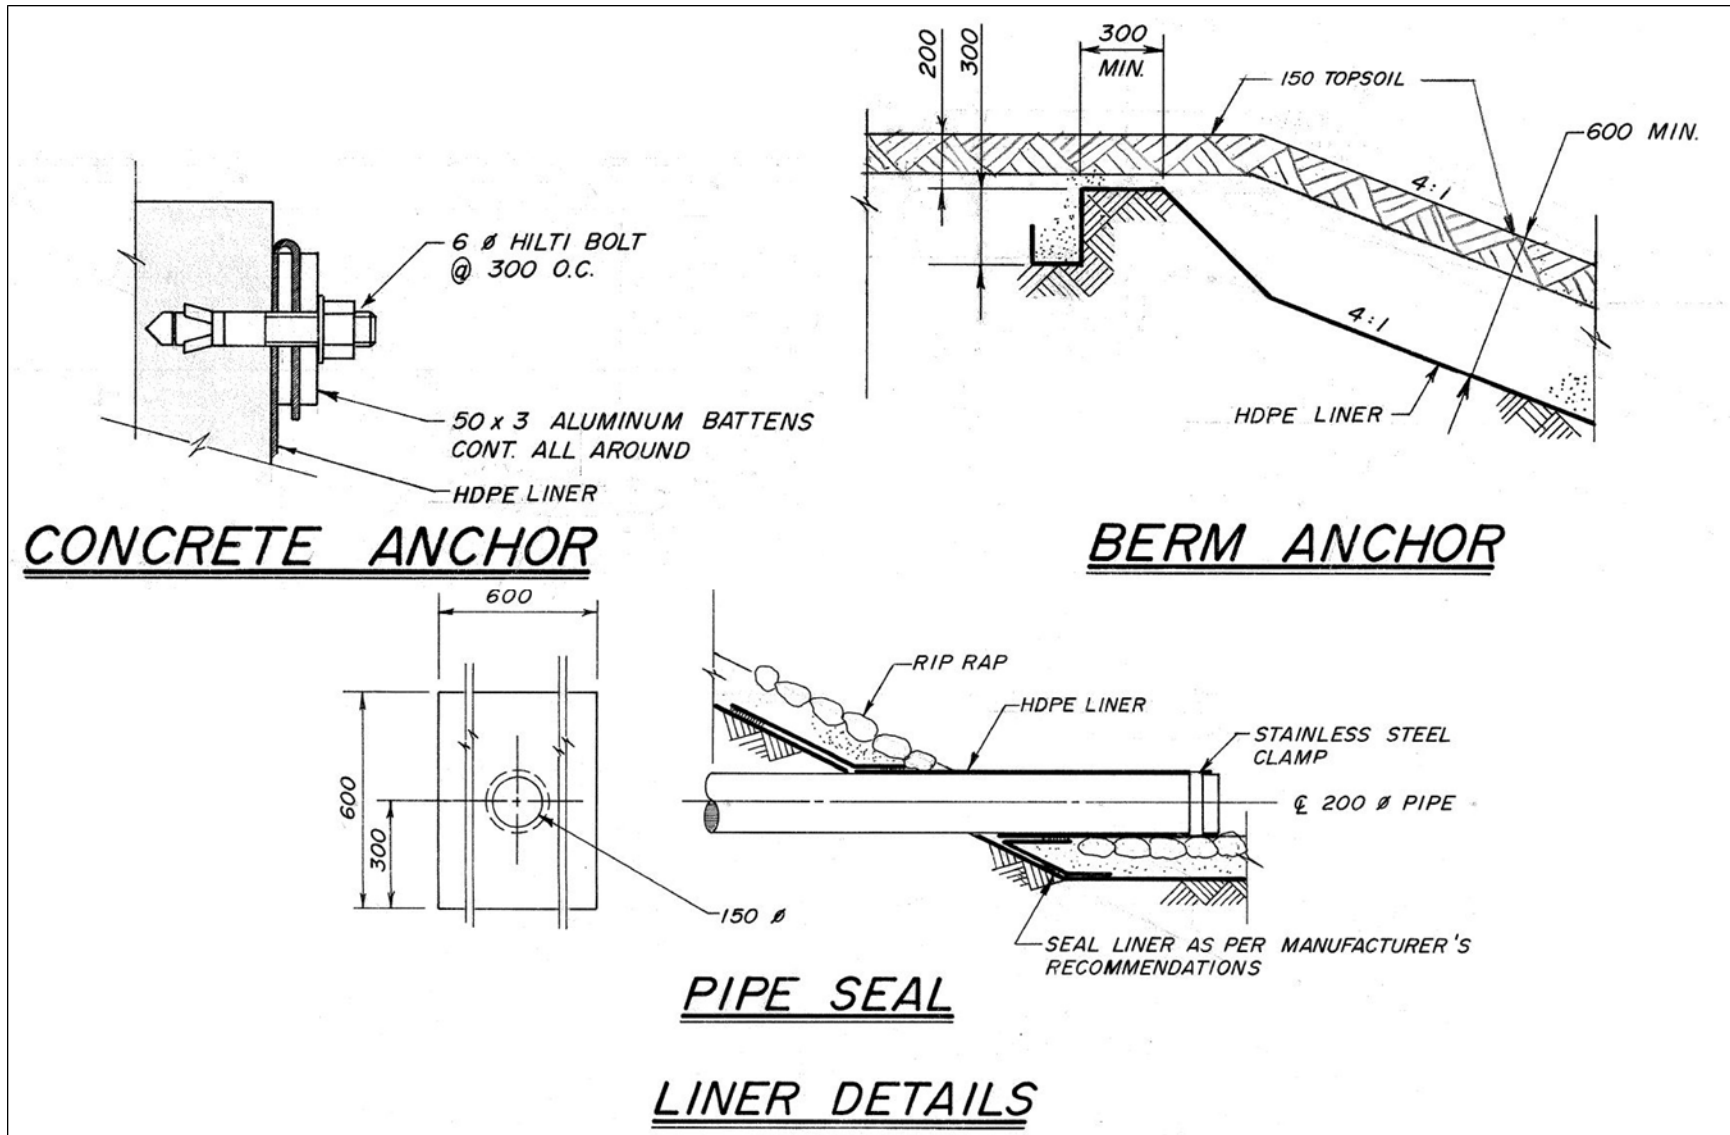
1988 Construction drawing - Liner details (Modified from Bullée Consulting Ltd. 1988c)
